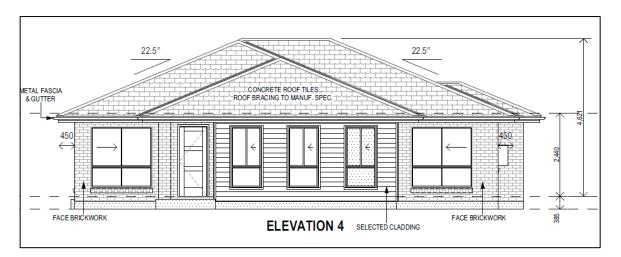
Elevation of Proposed Unit 1 from Eaglesfield Street
